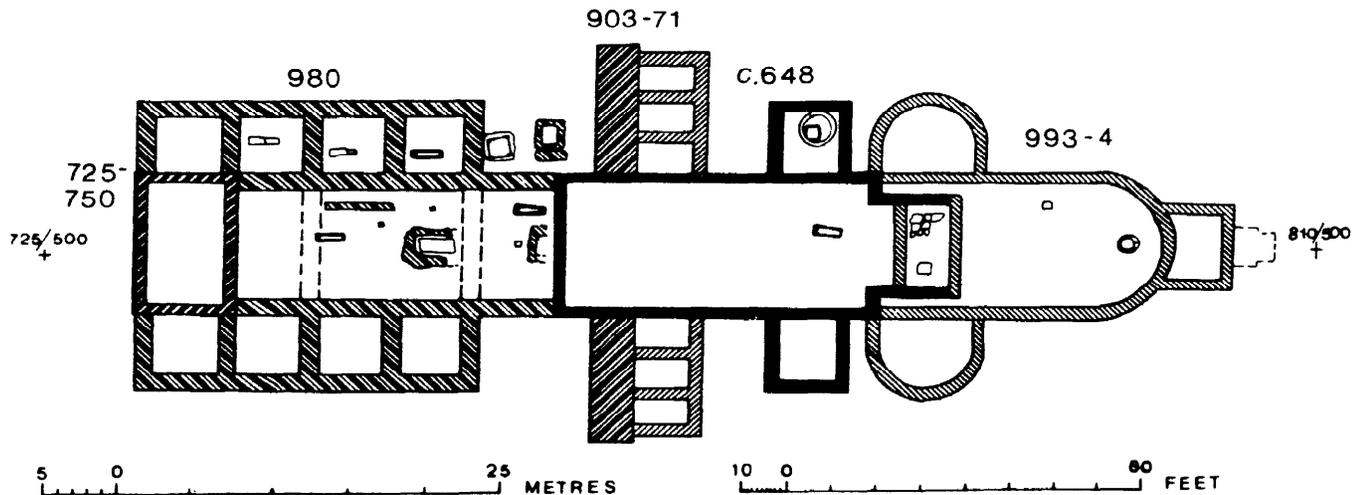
Winchester: Old Minster in its final stage c 993/4-c 1093/4; the plan shows reconstructed standing walls; 7th century minster church in black (scale 1:500)
